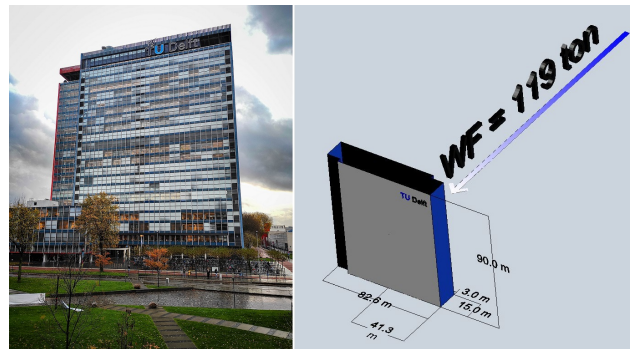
3D visualization of the EWI building, its dimensions and the 119 ton horizontal wind force vector acting on the West façade. Picture of EWI's East façade (left) and AutoCAD 3D drawing of East façade (right)
